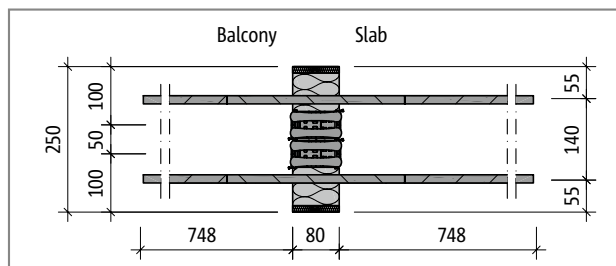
Schöck Isokorb® T type Q-E-V7-L250: Product layout
